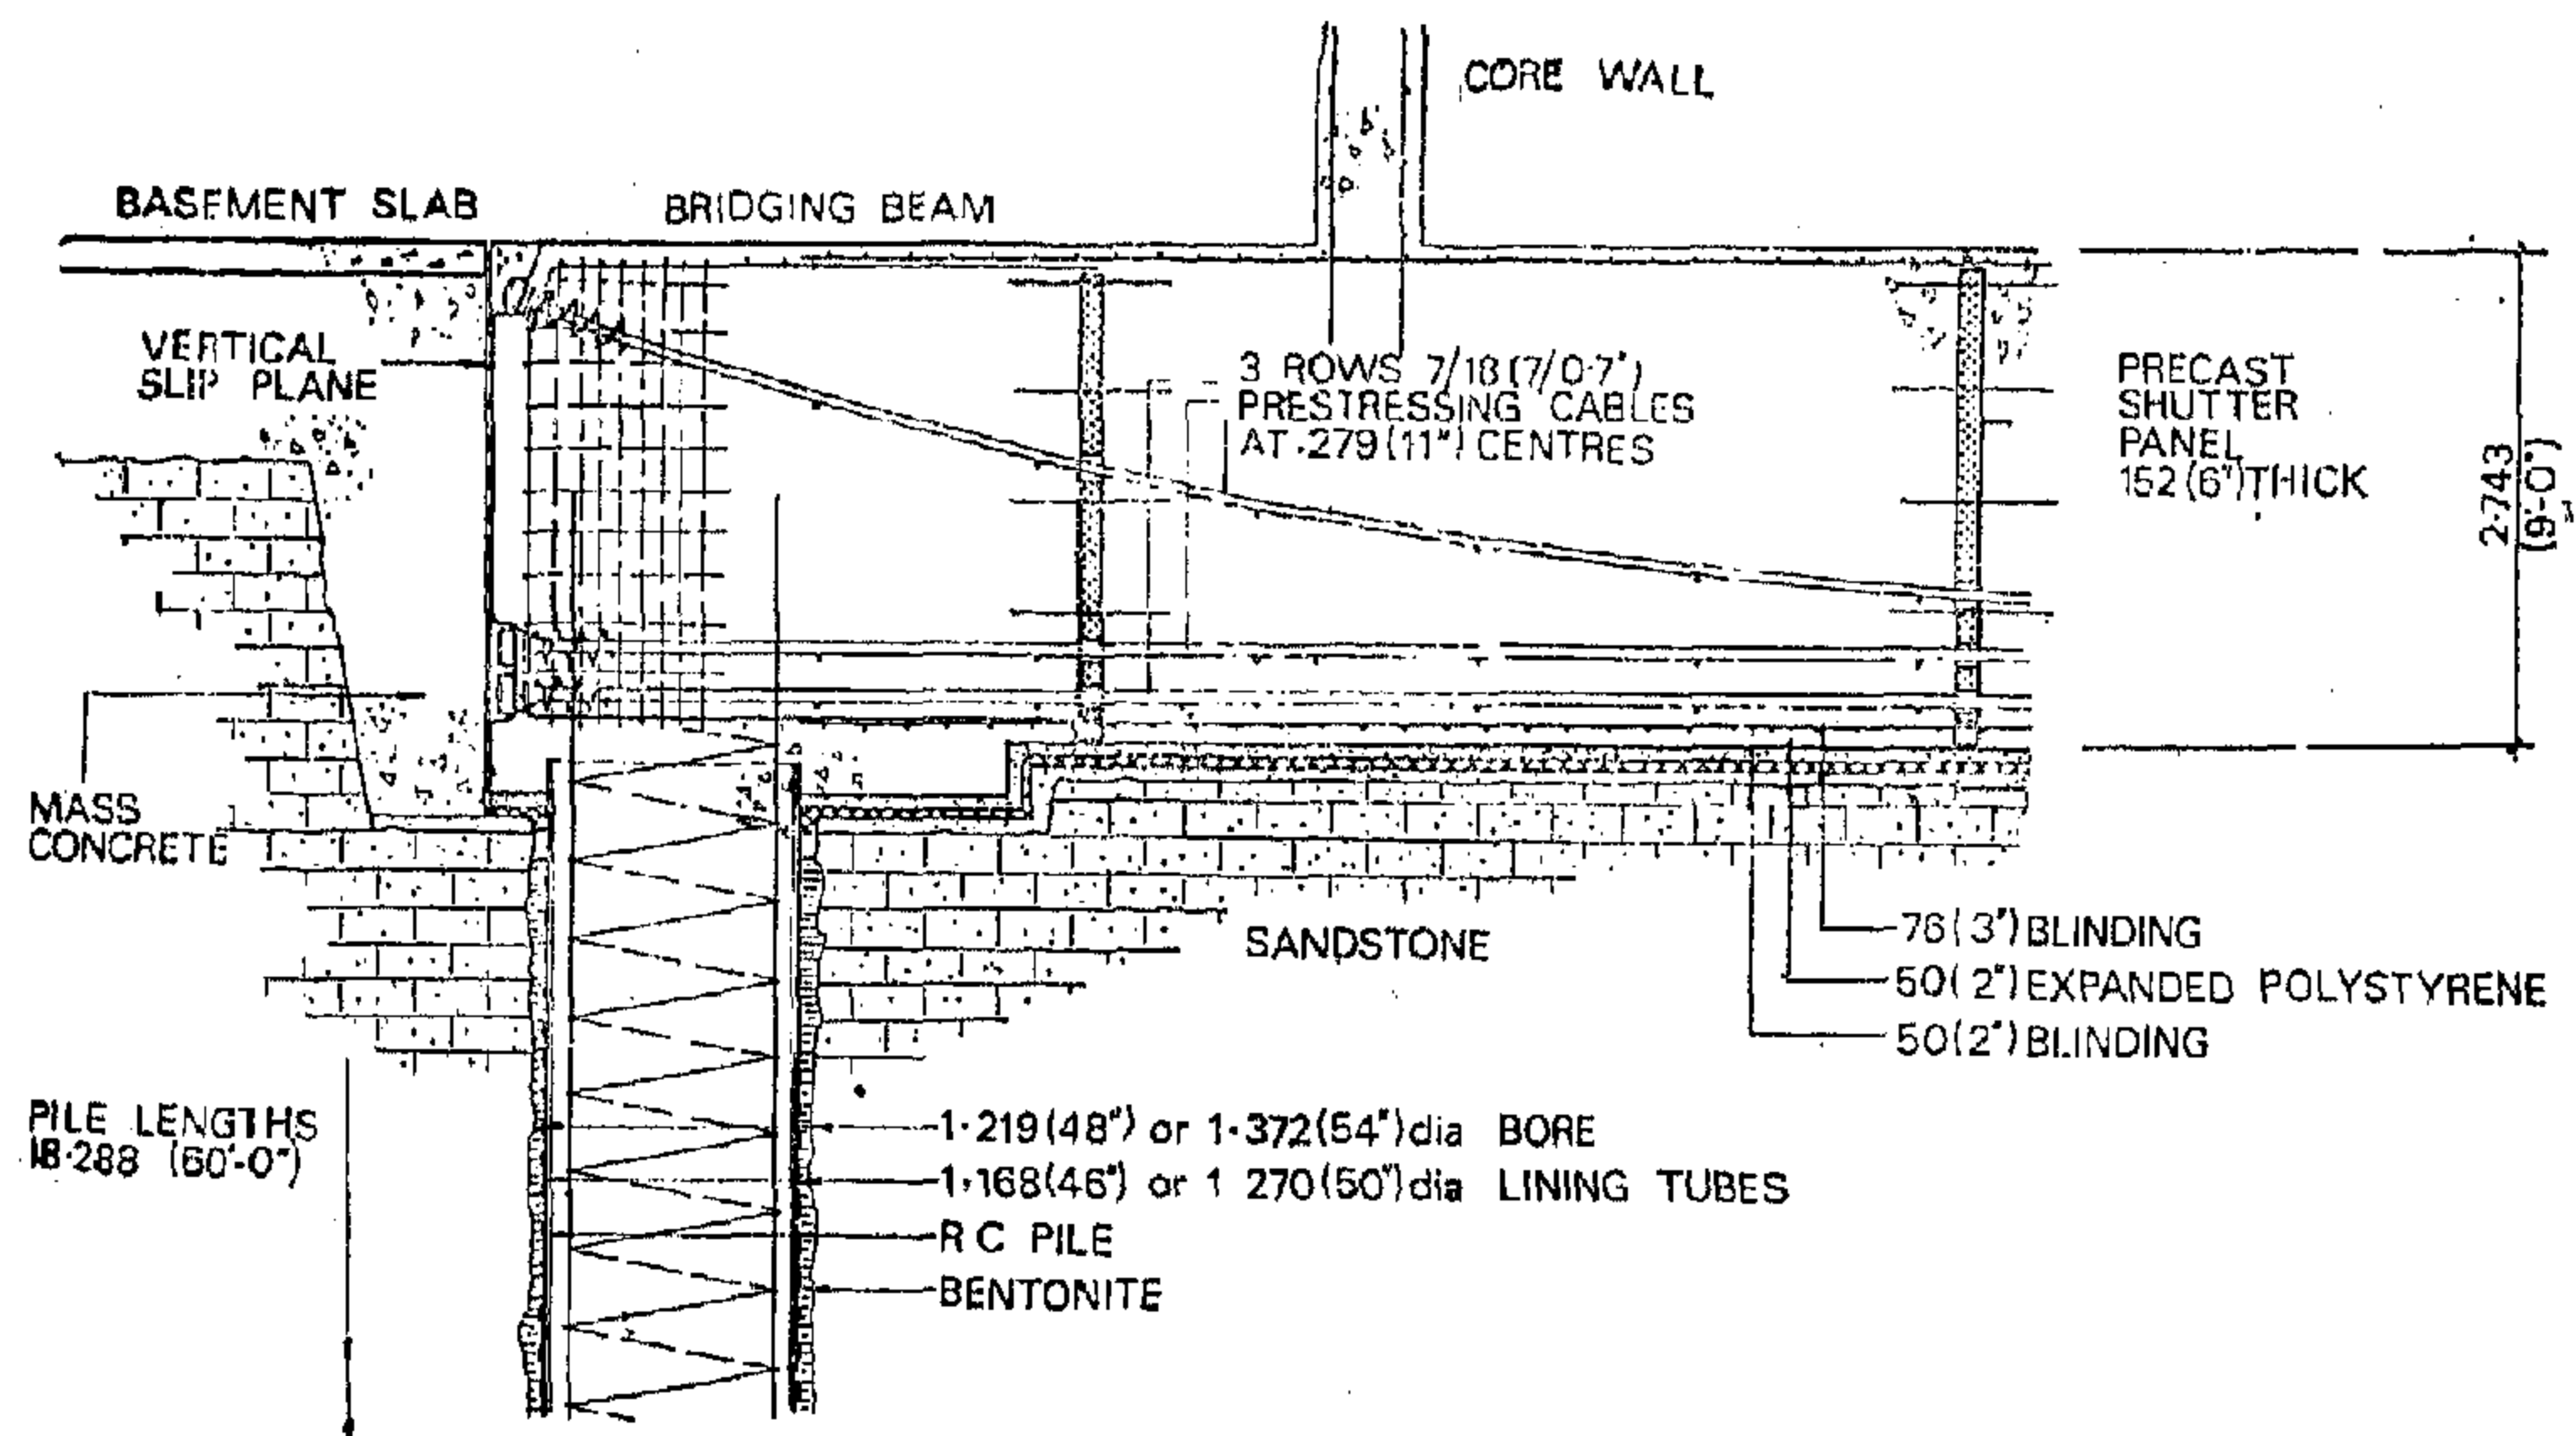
Typical details of a pile-to-slab connection showing the floating form of construction.
